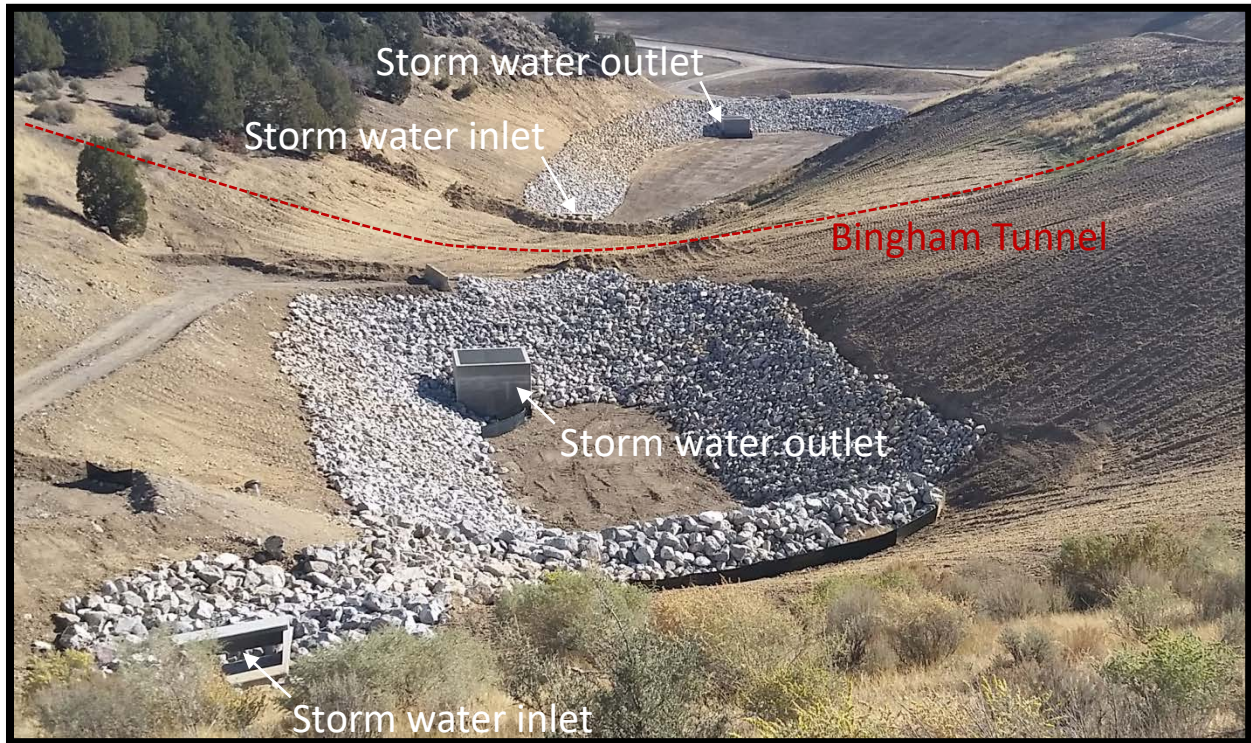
Keystone detention basins straddling the Bingham Tunnel.
